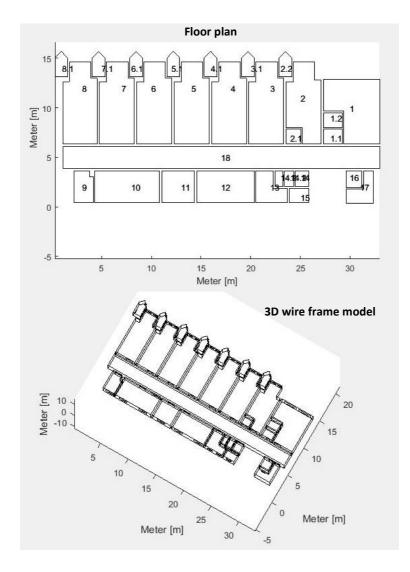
Case study 2 (2. floor of hospital) with modeled floor plan and reconstructed 3D model based on manually audited building elements represented in the developed model (top: floor plan; bottom: 3D view in isometric projection¹⁴) Automatically recognized building elements by the sensor and sensor processing software were walls, floor, ceiling, windows, doors and electrical outlets. Manually, further building elements were audited such as TEQ drinking water, TEQ waste water, TEQ heating and TEQ IT emergency. The data set of indoor building information capture in the CSV-interface and OBJ-interface of the examined hospital level (2.OG) include the following numbers of vertices, faces and building elements that are aggregated in Table 5-13 and Table 5-14. Both tables differ in the amount of automatically recognized building elements and the real number of building elements.
